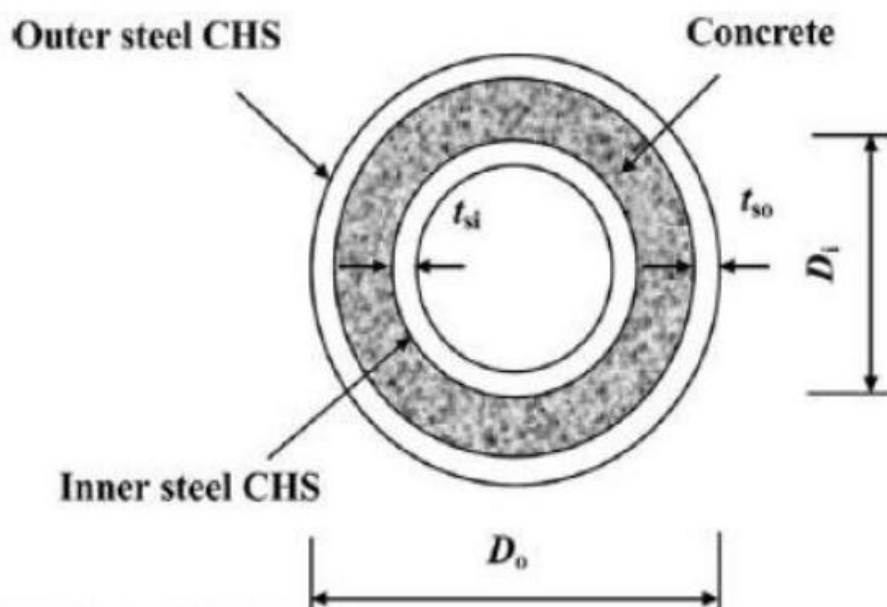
Cross sectional view of hollow steel column in-filled with concrete [1].
